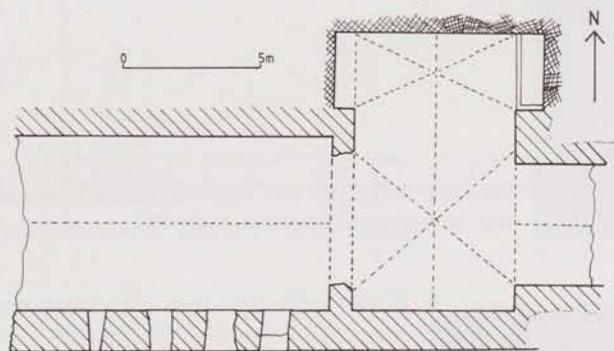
Mazra'a (No. 88). Plan of medieval building.
